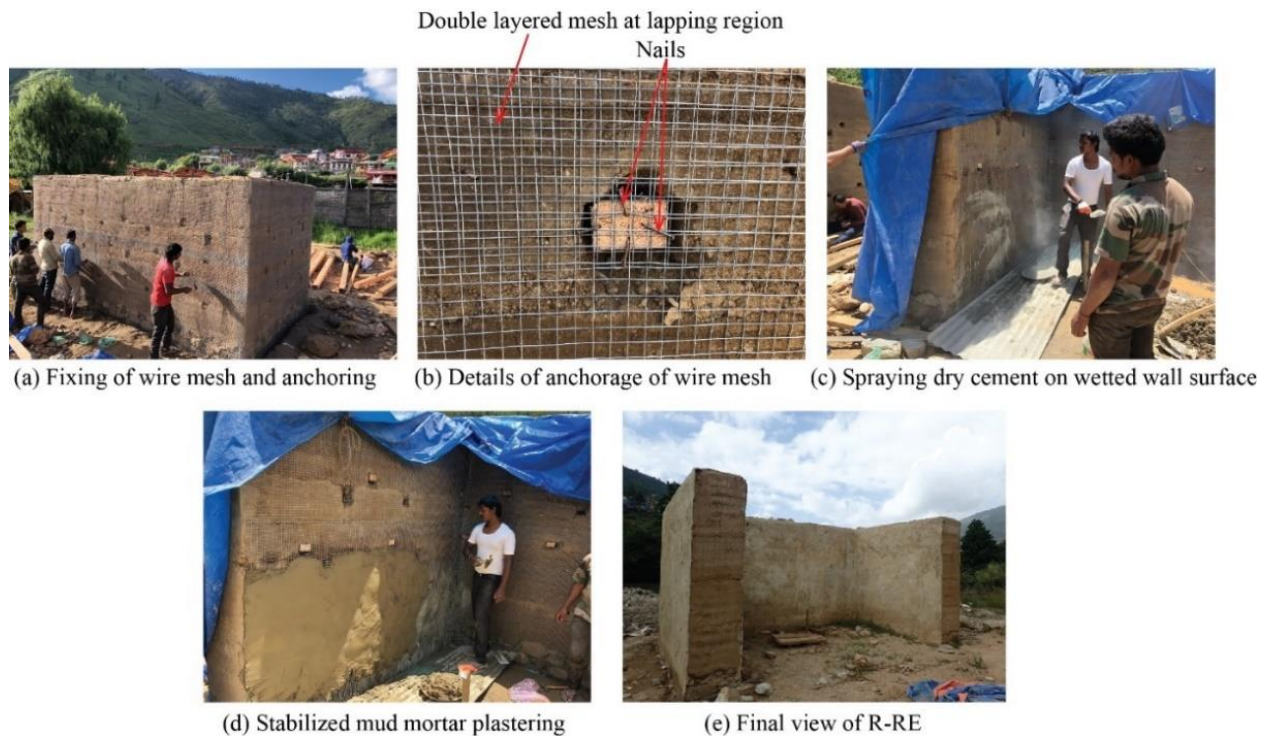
Construction details of retrofitted rammed earth specimen (Mesh-RE).
